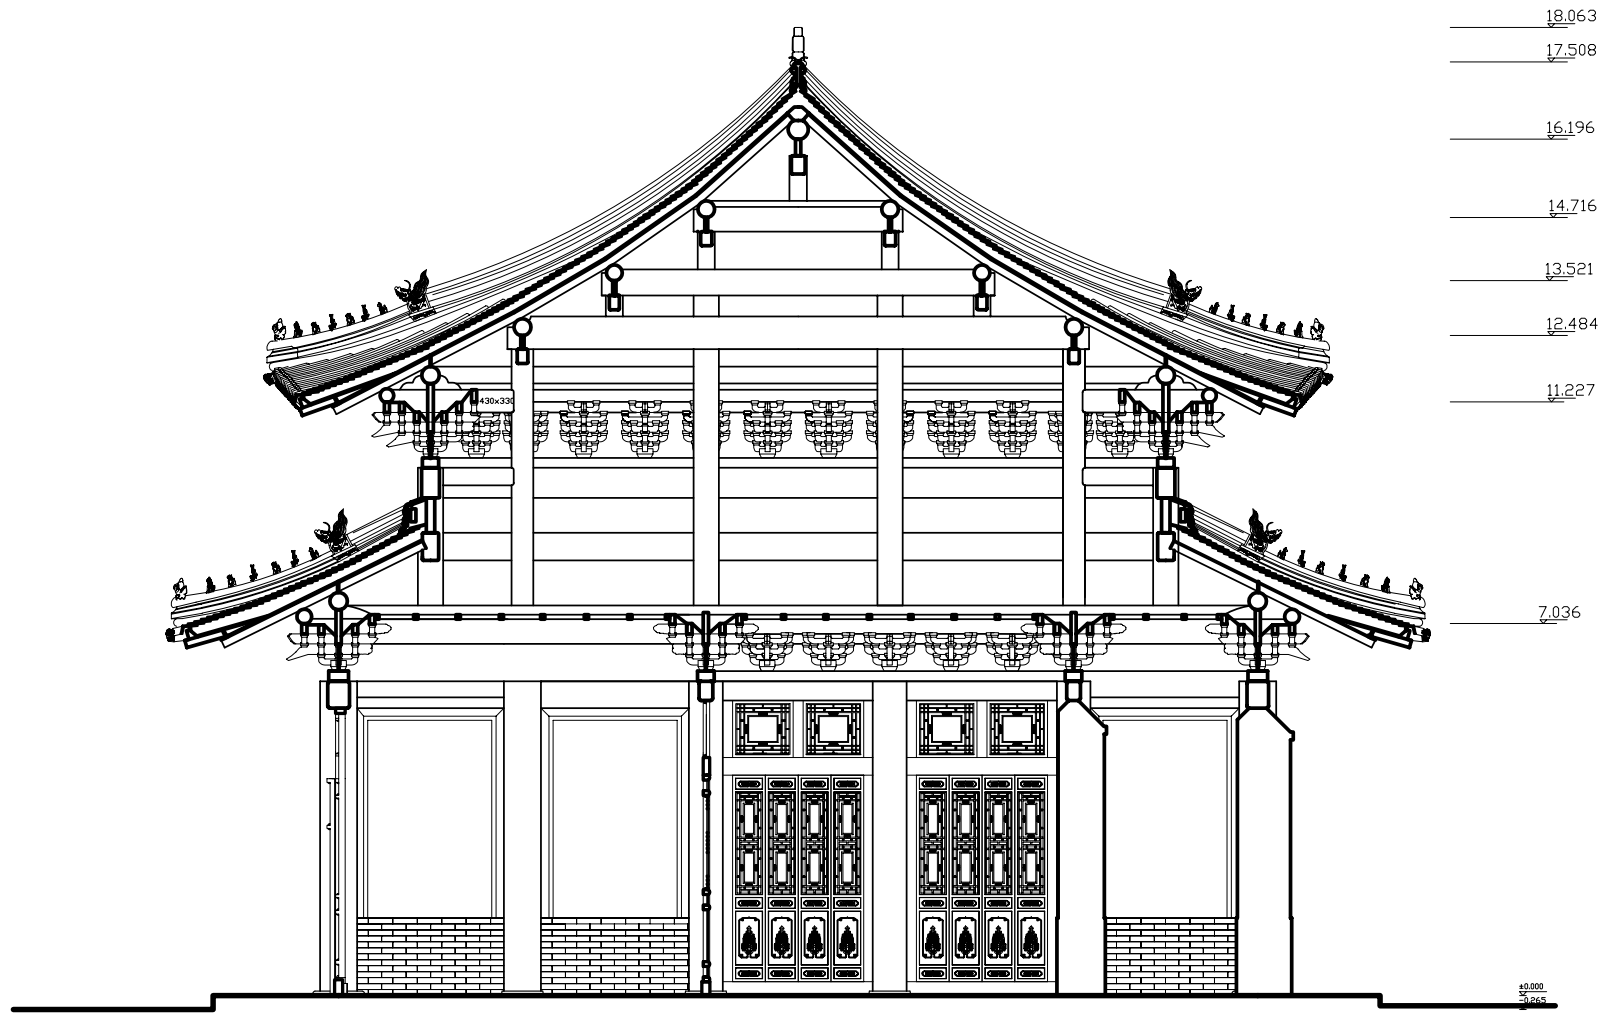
J-3 Back elevation of Junji Hall of Zhongyue Temple
